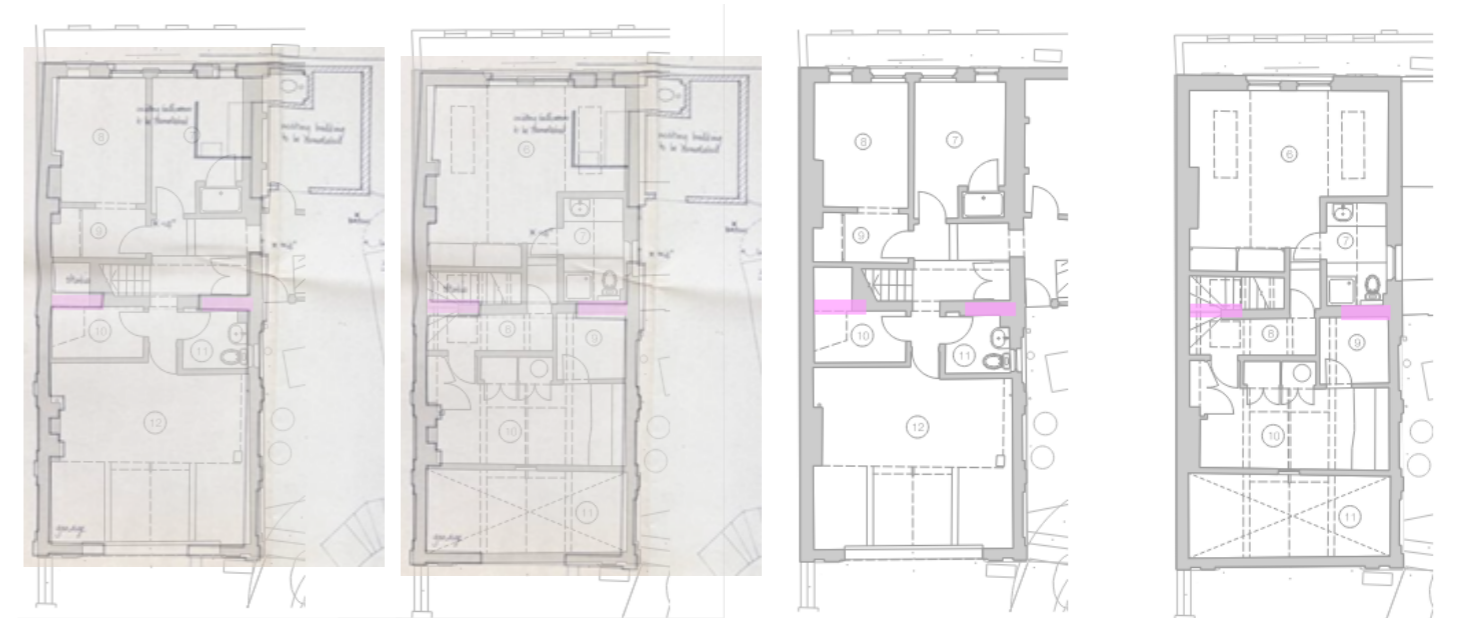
Existing plans overlaid with existing 1958 plans. Nibs highlighted in pink.
